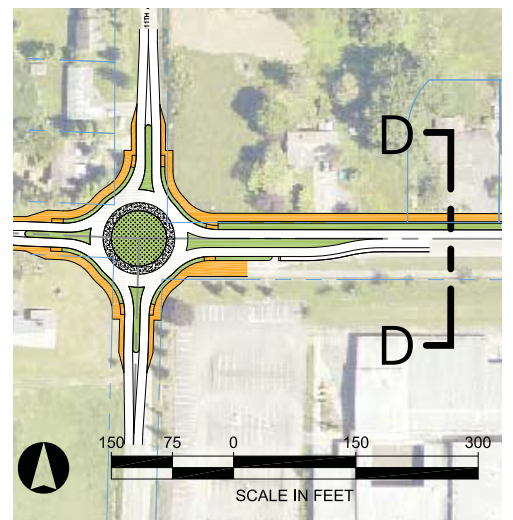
Proposed 172<sup>nd</sup> Street NE plan just east of 11th Ave NE.
